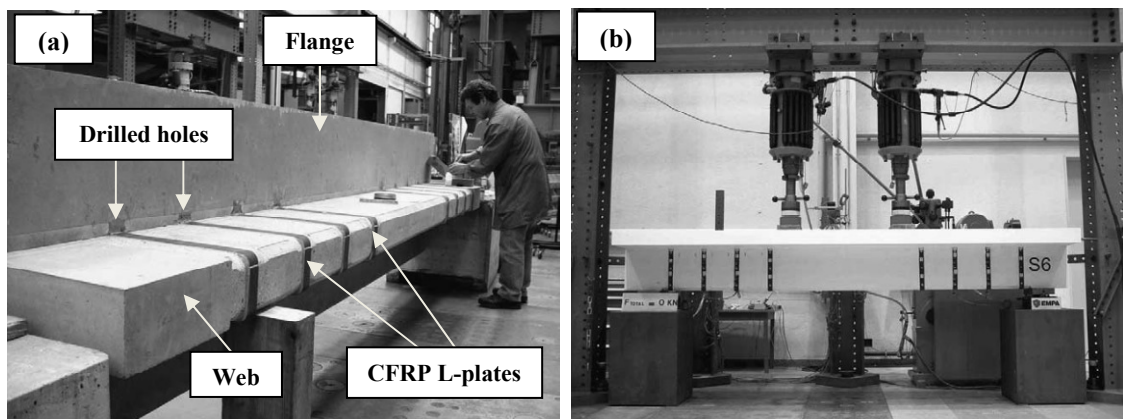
(a) Application of CFRP L-shaped plates to web of specimen beam S6 and (b) testing set-up (Czaderski & Motavalli, 2004)
